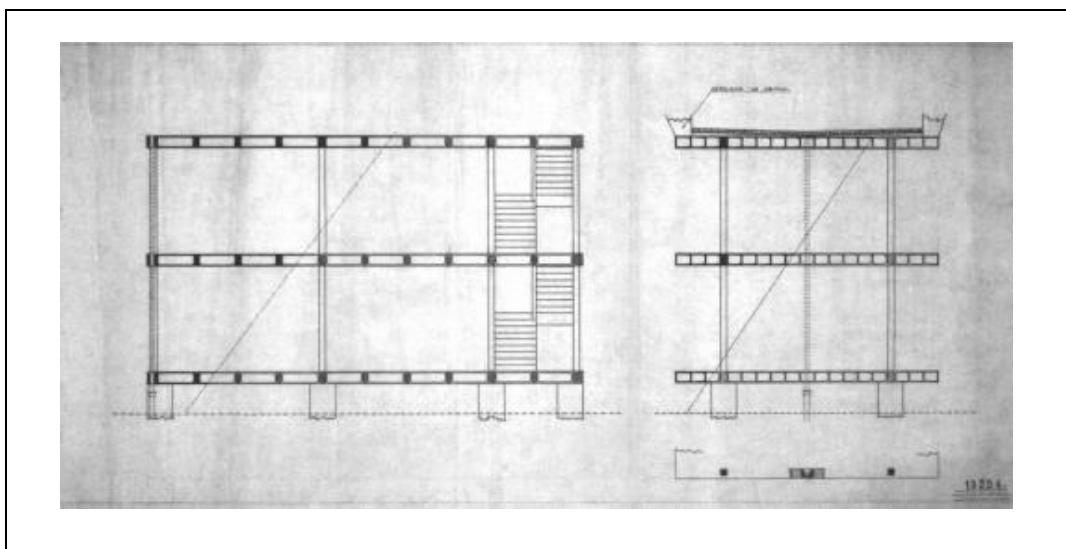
Dom-Ino House section showing fabricated reinforced concrete layers [40].
